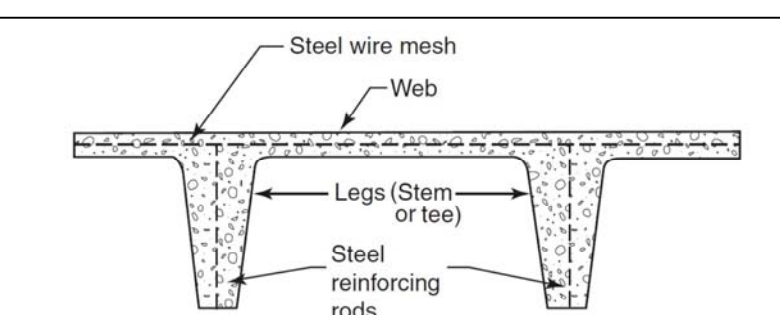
(5) Typical Concrete Joist Construction.
